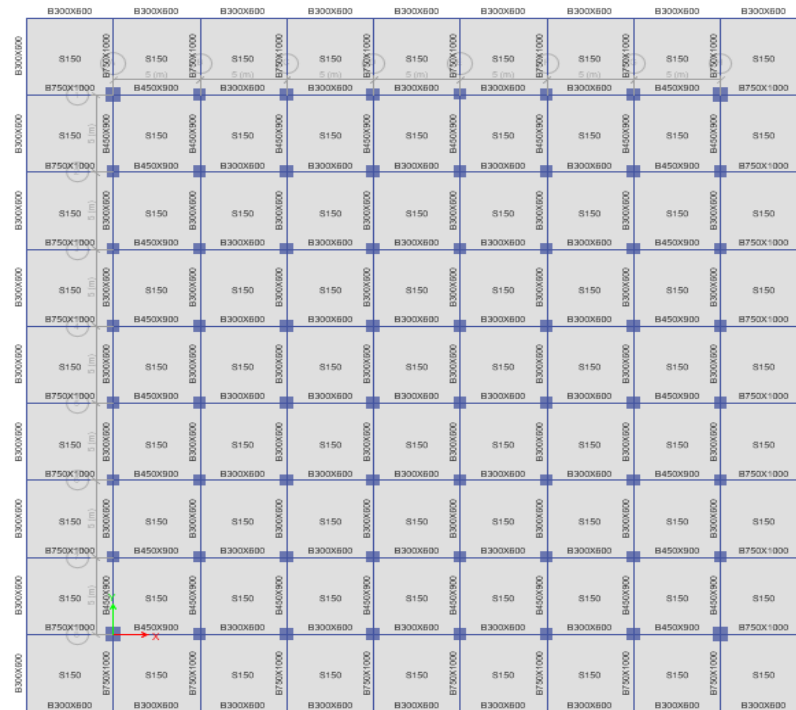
Symmetrical structure plan storey 9 & Above.
